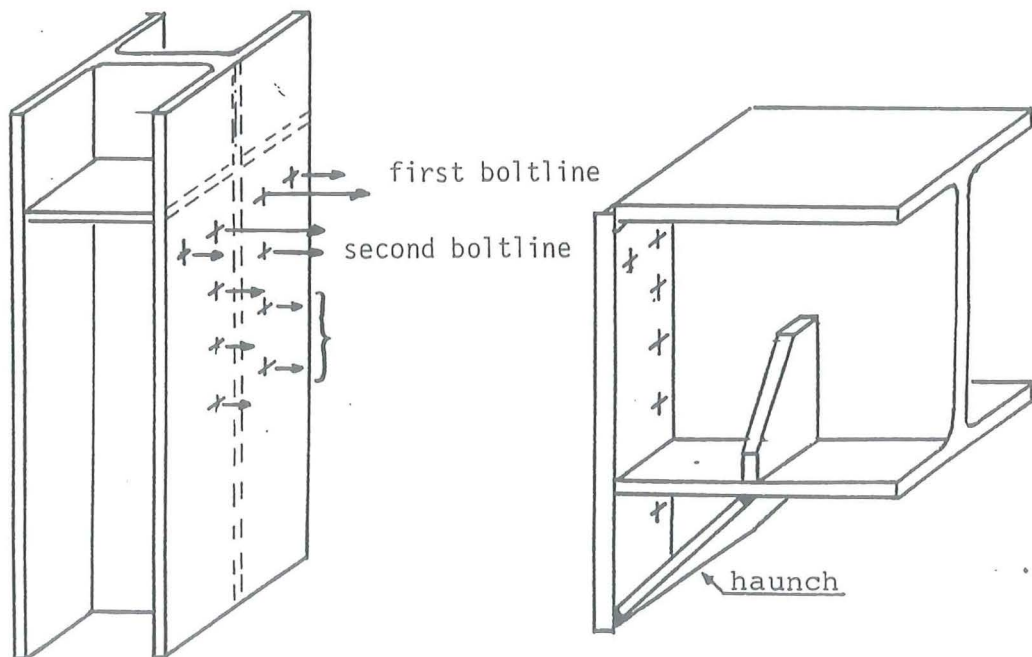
Purpose of the tests: - to confirm the design method of the corner bolts
